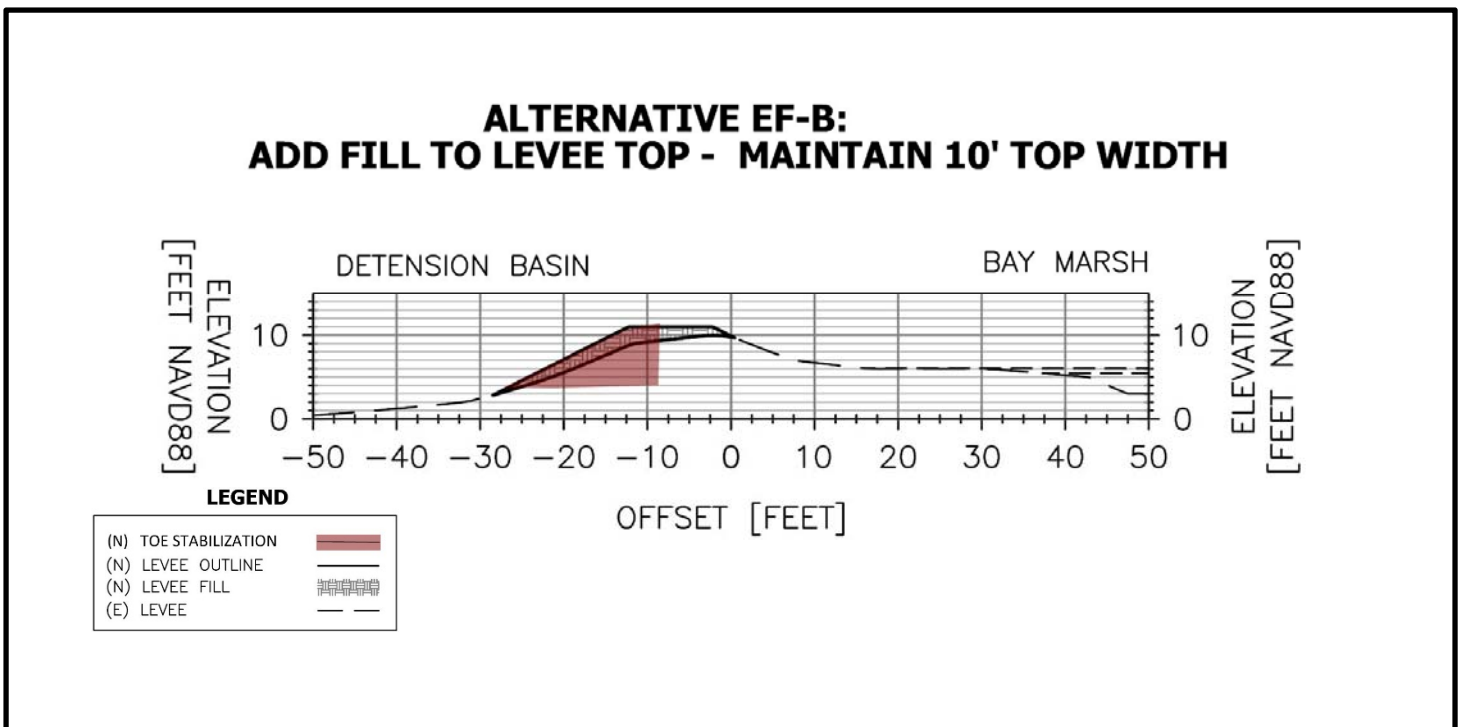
B: Typical Fill Section - Alternative EF-B (2:1 Slope, Levee crest top width = 10 ft.)
